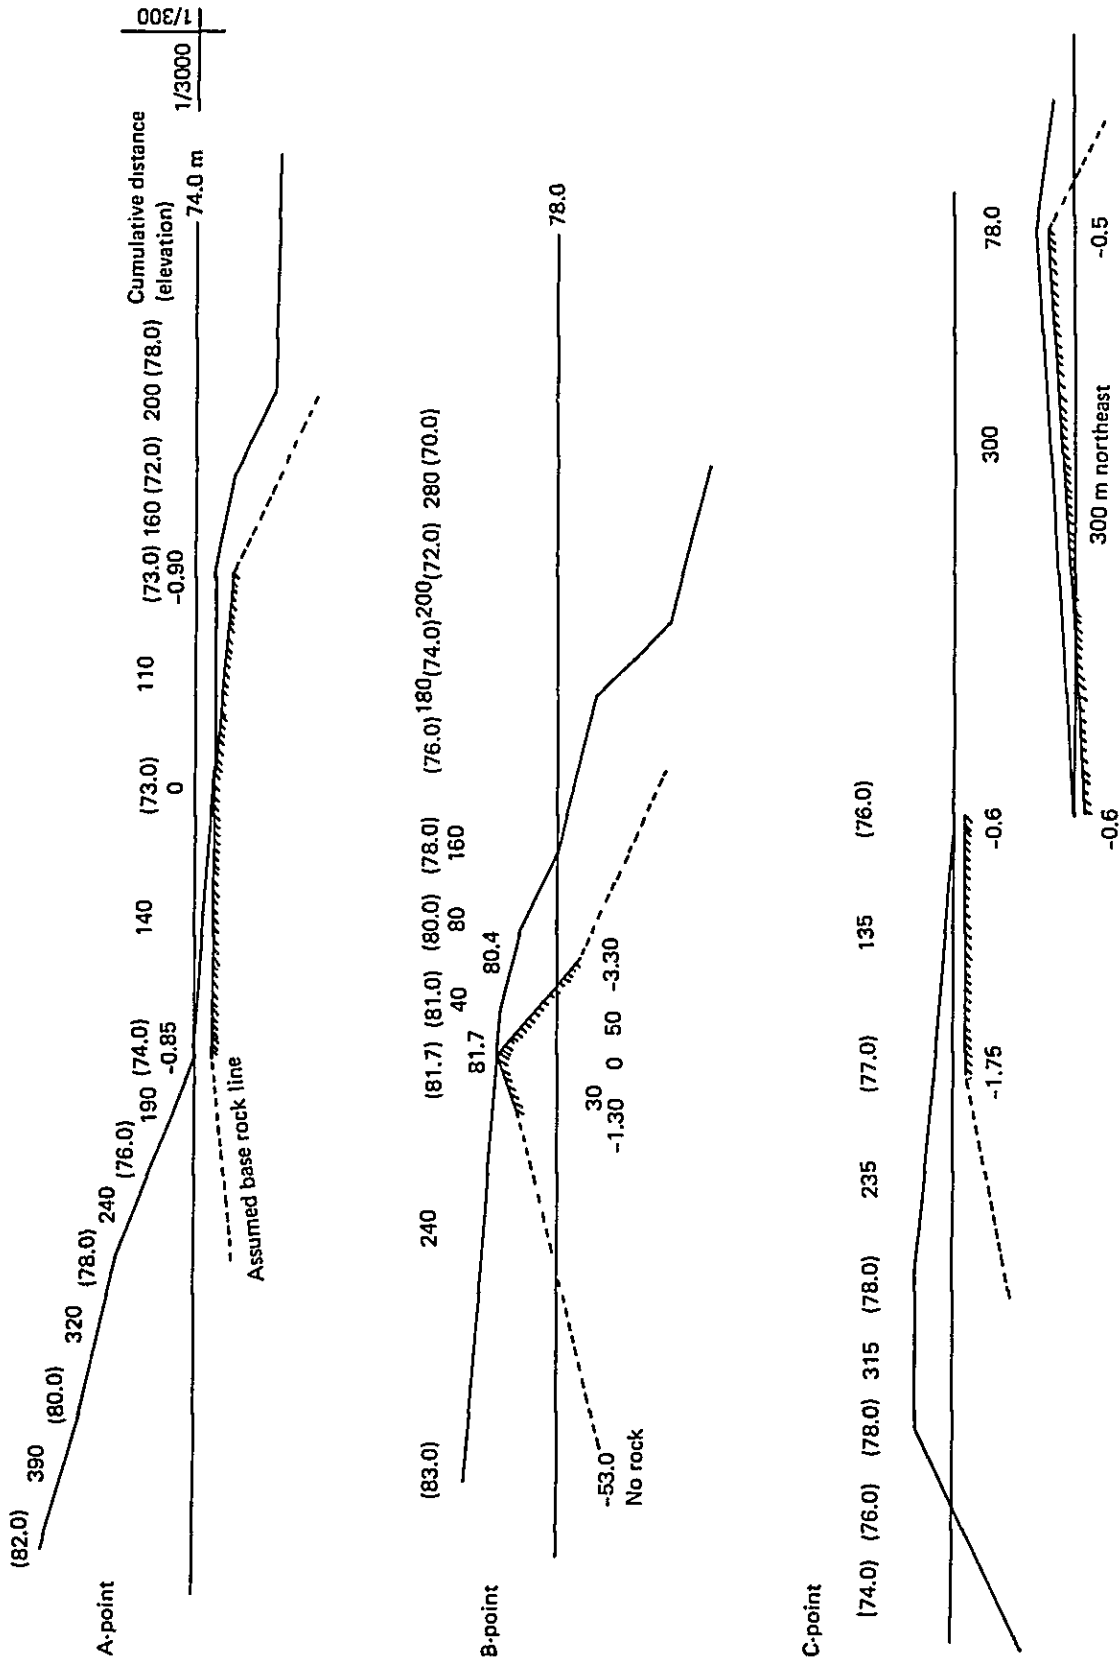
Assumed Base Rock Section between Santa Ana Stock Farm and Previous Airport
